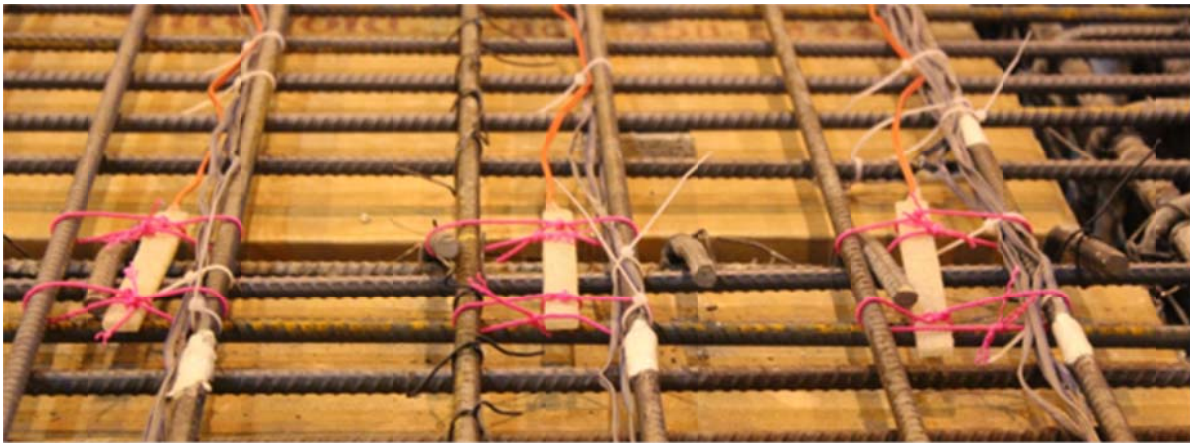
Embedded concrete strain gages used in the soffit slab part of the box-girder
